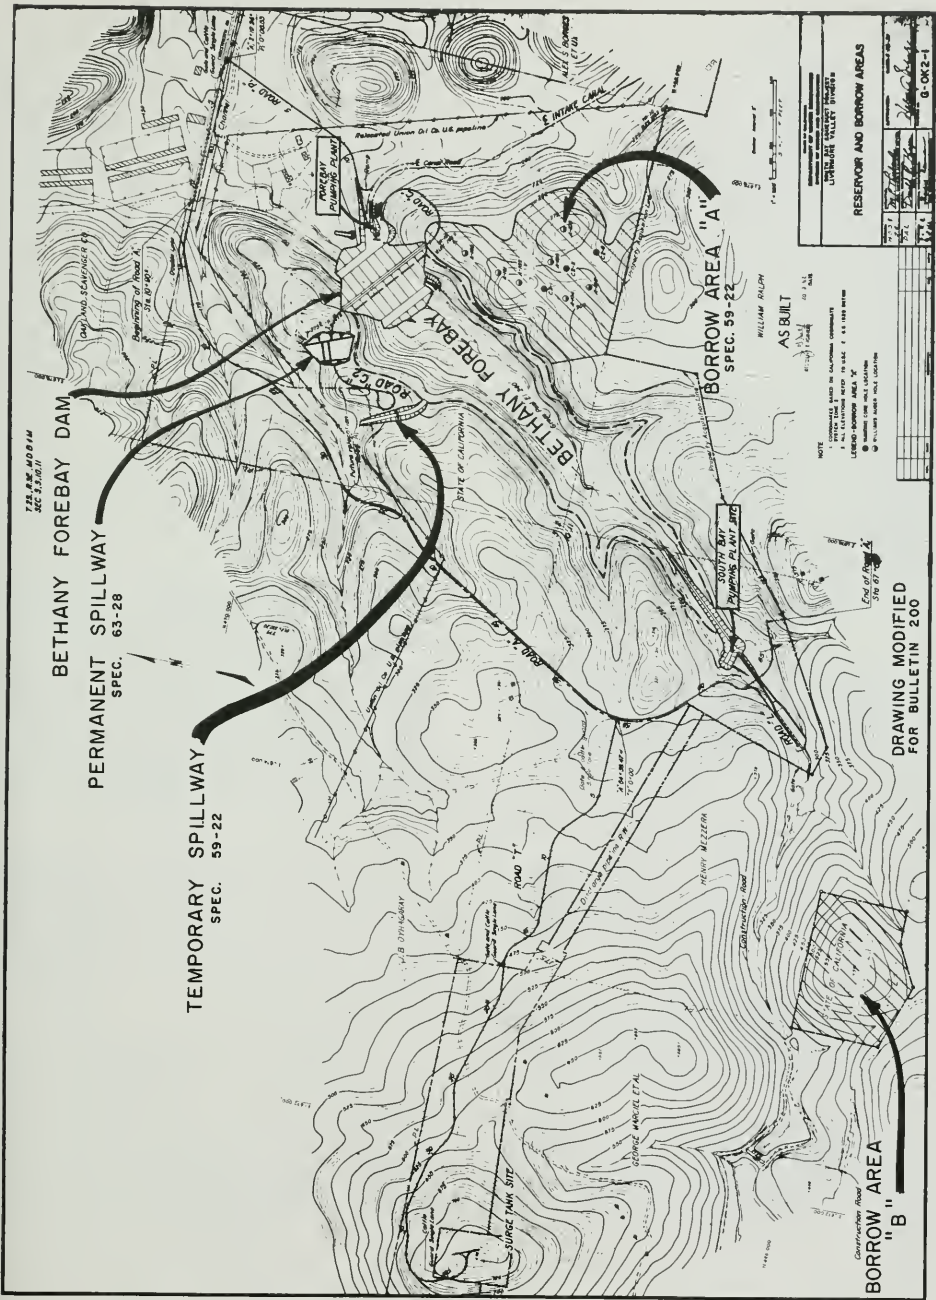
Location of Borrow Areas and Bethany Forebay Dam Site
